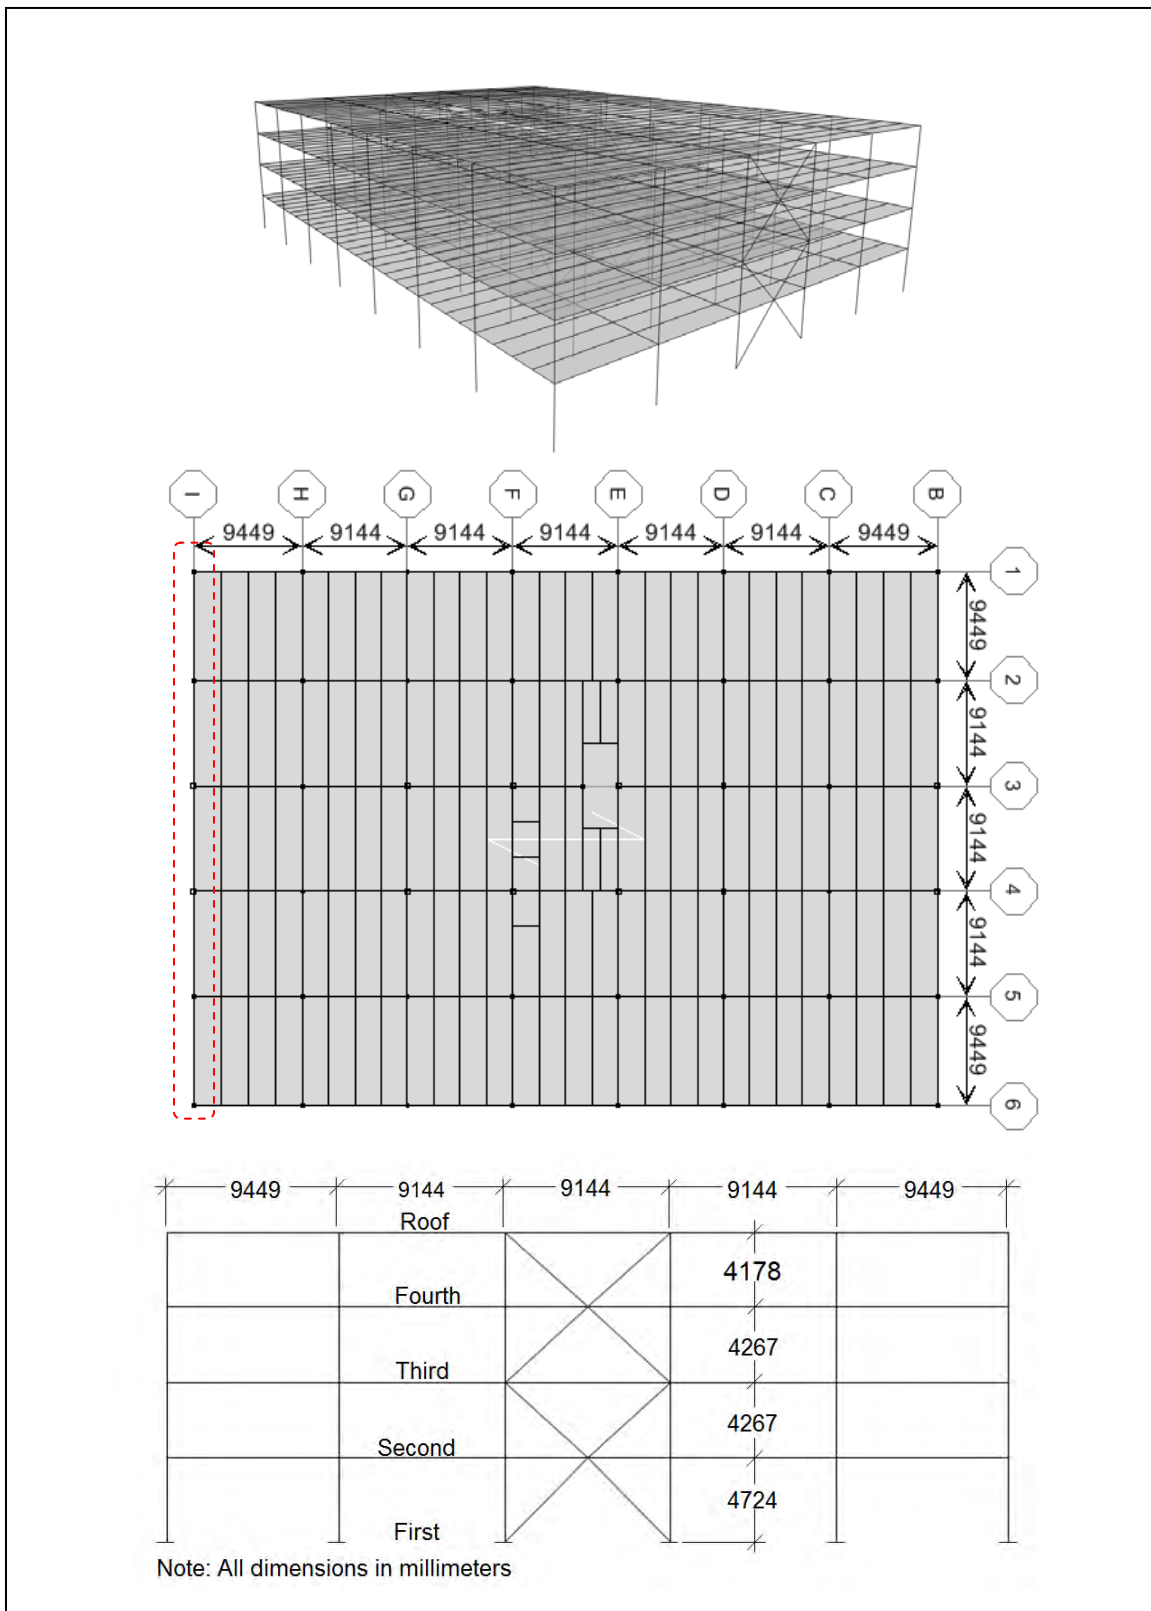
Building BF-4 3D, Plan and Section at Gridline I
